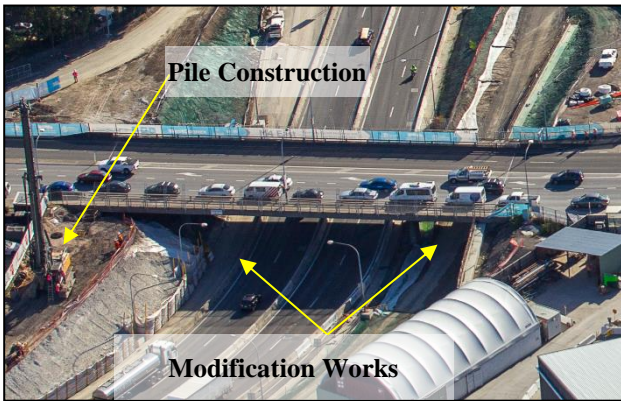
Pile construction and M4 lane works at the existing Concord Road Bridge in April 2017 (site photo).
